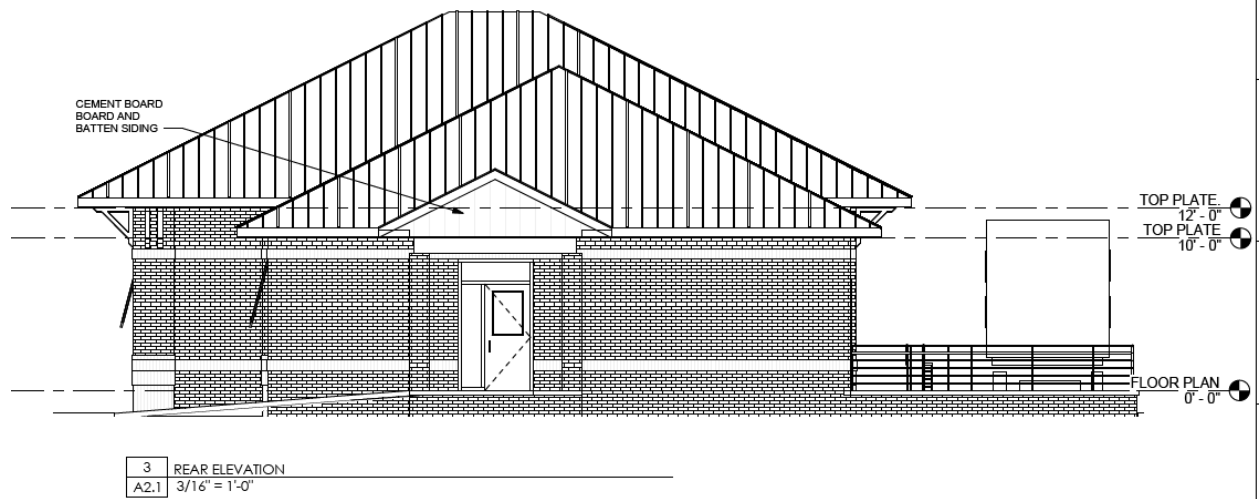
# EXHIBIT D: PROPOSED ARCHITECTURAL ELEVATIONS
